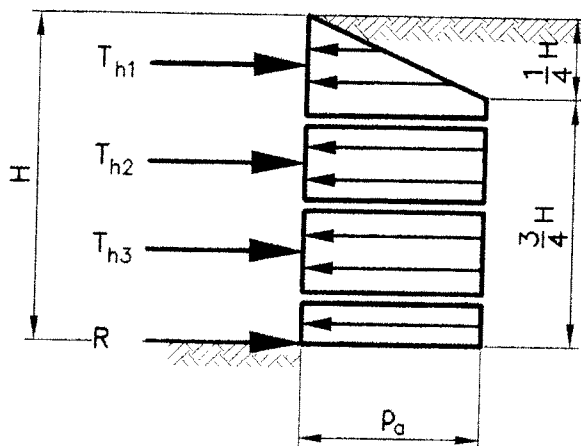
1 Apparent Earth Pressure Distribution for Anchored Walls Constructed from the Top Down in Soft to Medium Stiff Cohesive Soils.
